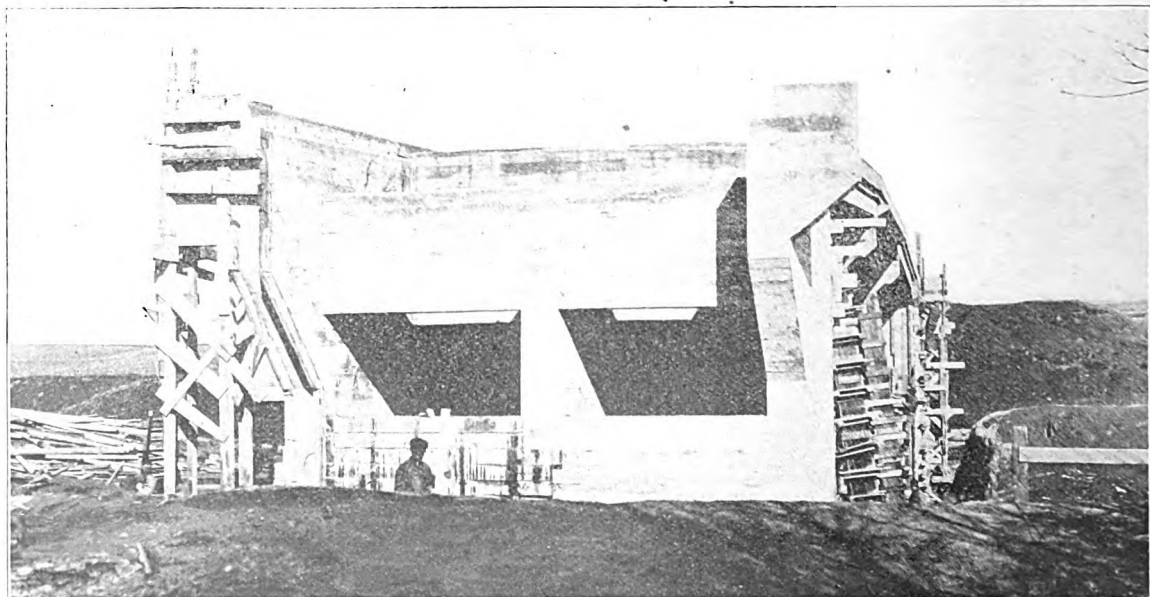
Standard U-Abutment, Overhead Highway Bridge, Near Delmar, Iowa.
